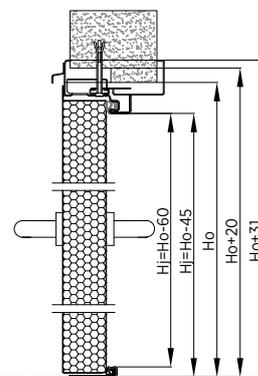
Installation of the double-leaf door to a masonry wall - wrap-around frame with a thermal break - vertical cross-section
